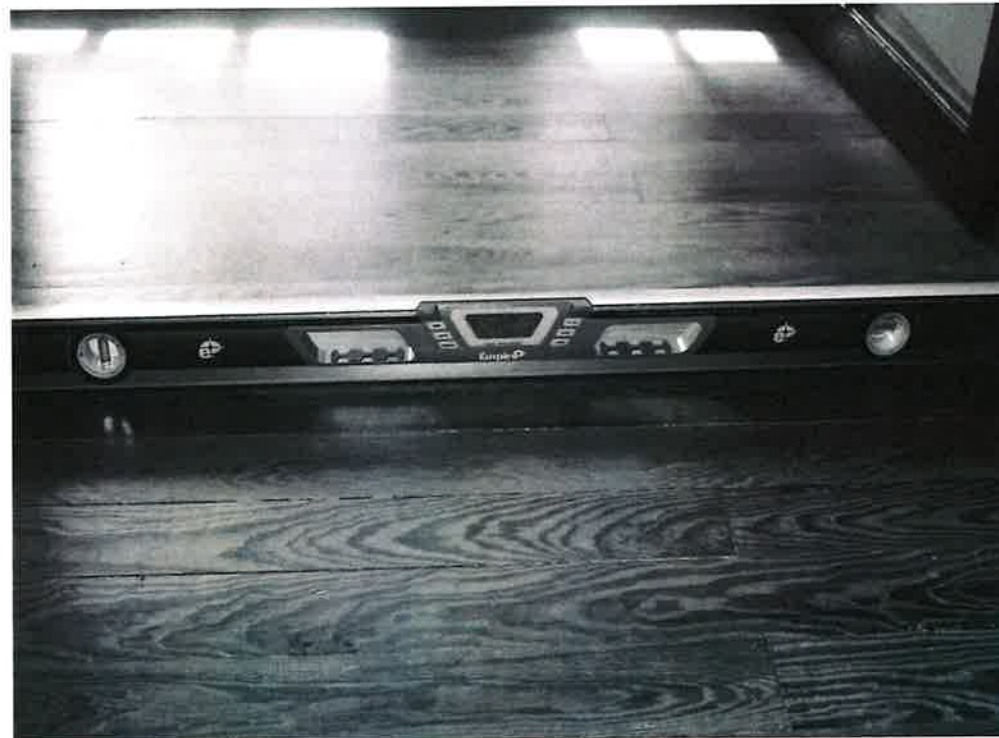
2-degree slope in first floor near east elevation running north to south.
